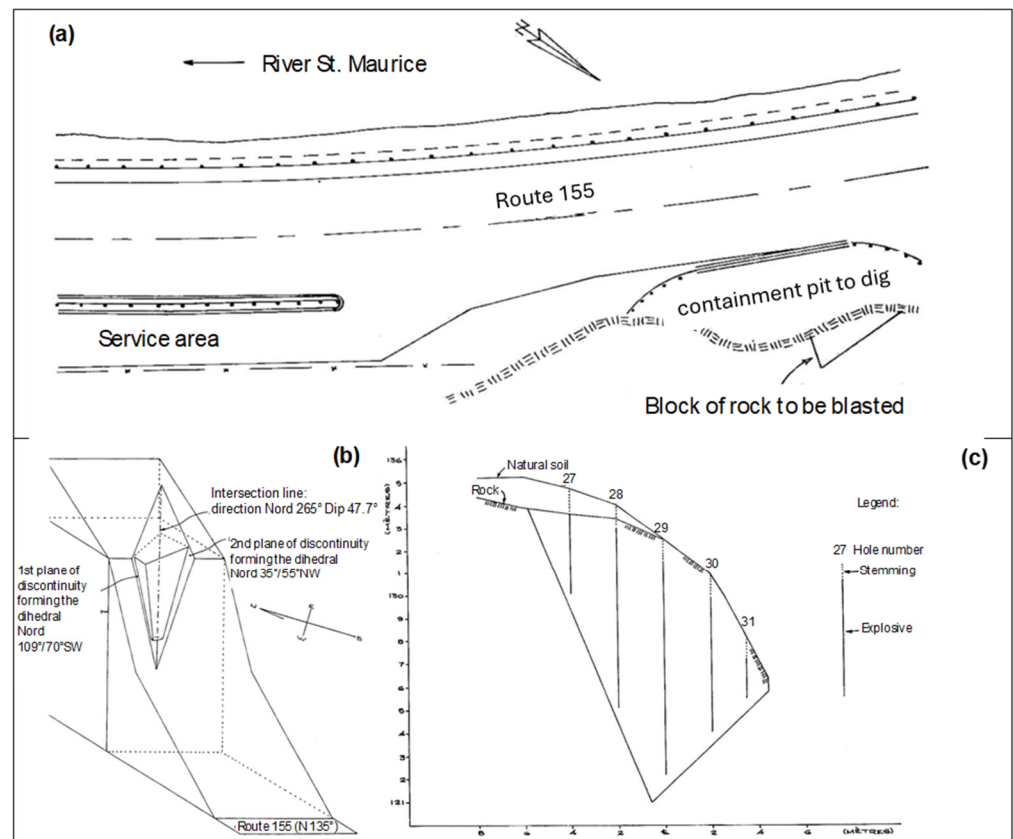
The case of Quebec highway 155. (a) Plan view of the blasting project; (b) perspective view of the dihedral to be blasted; (c) lateral section of the drill hole pattern from the firing plan (modified after [19]).
